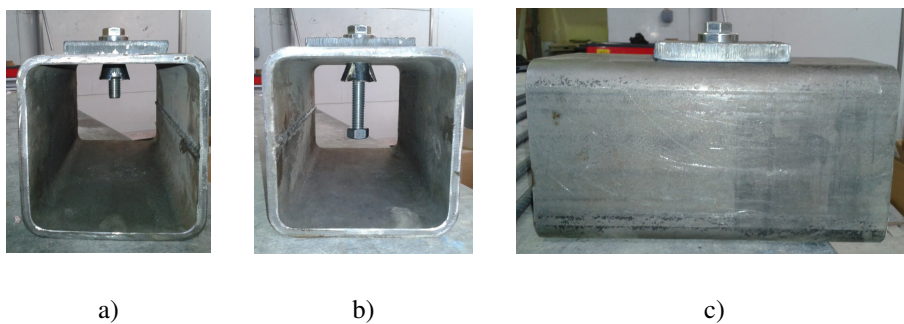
Test specimens before pouring the concrete: a) Hollo-bolt sample, b) Extended Hollo-bolt sample, c) lateral view.
